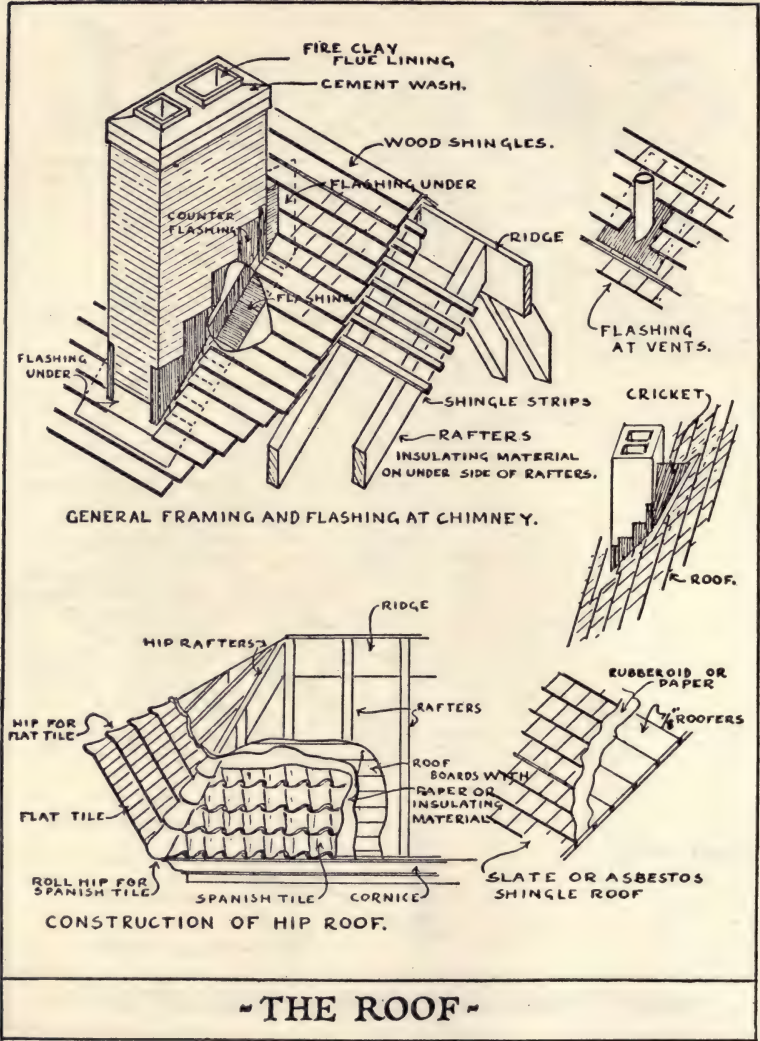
The roof, if faulty, is the place where the rain comes in and the heat goes out. All angles and points where pipes or chimneys pass through must be carefully flashed. Insulation under the attic floor or roof rafters is well worth while.
